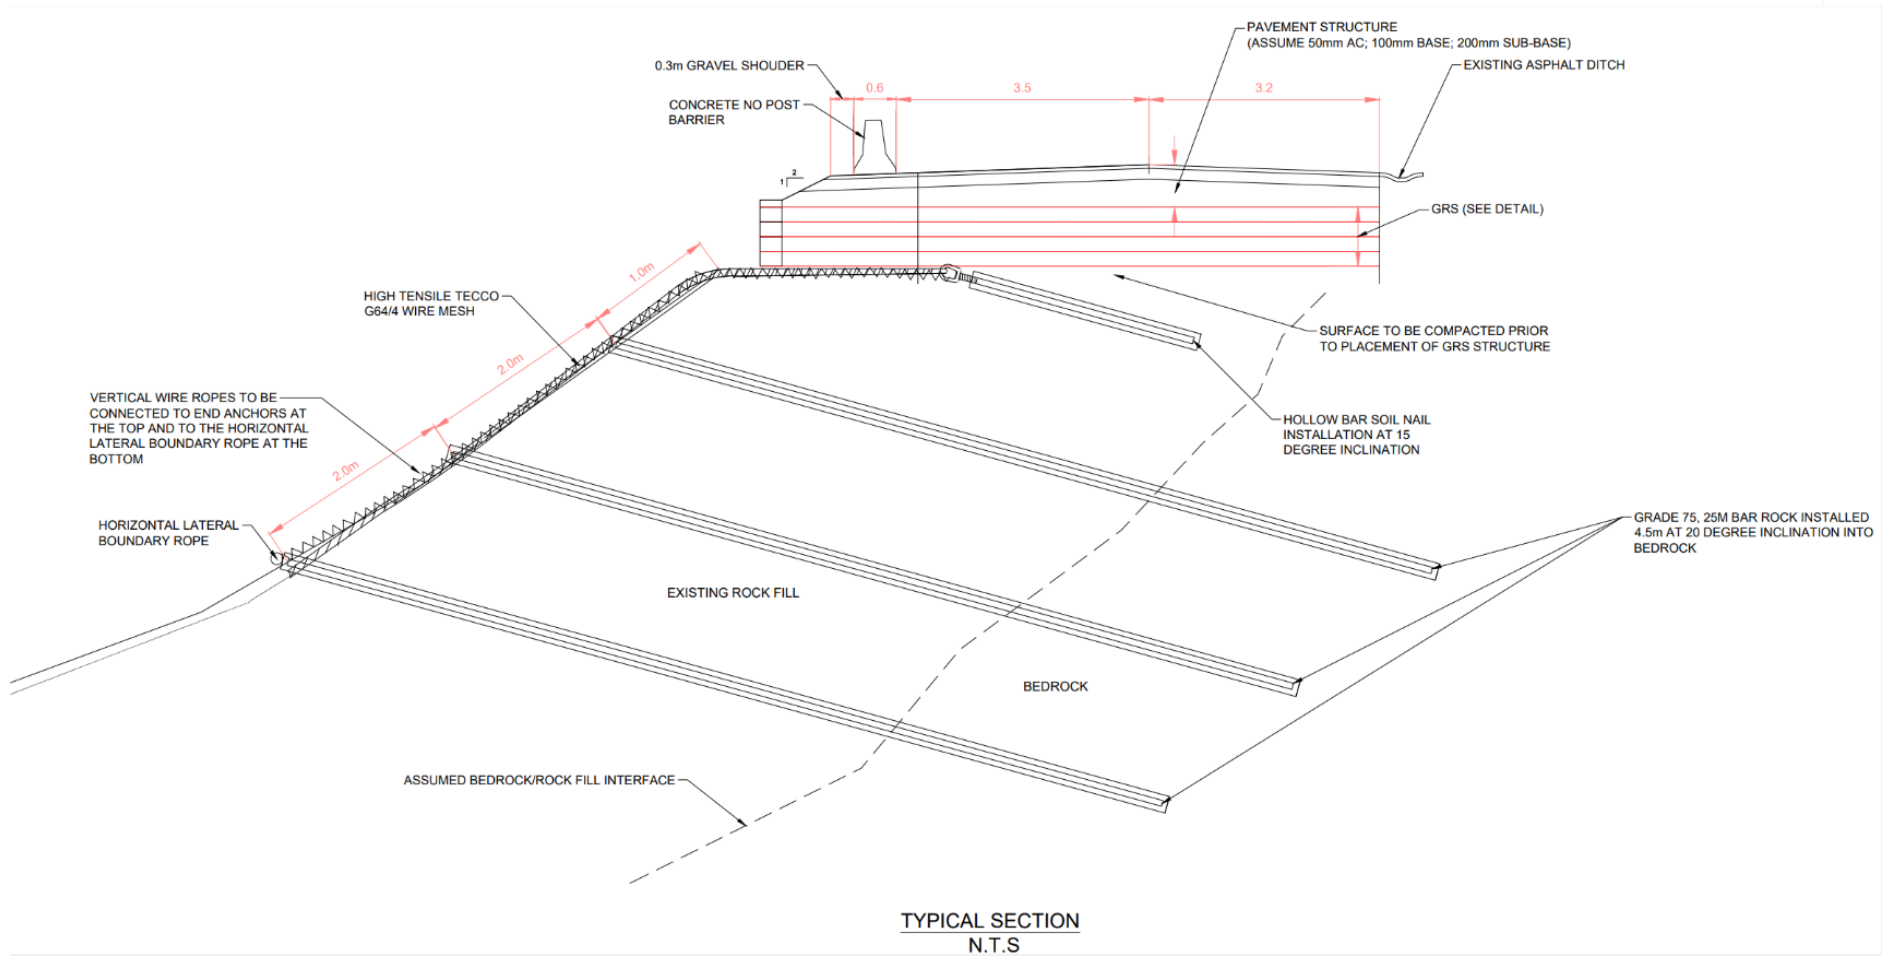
Example of Geotechnical Reinforced Soil (GRS) (section shown as red lines).
